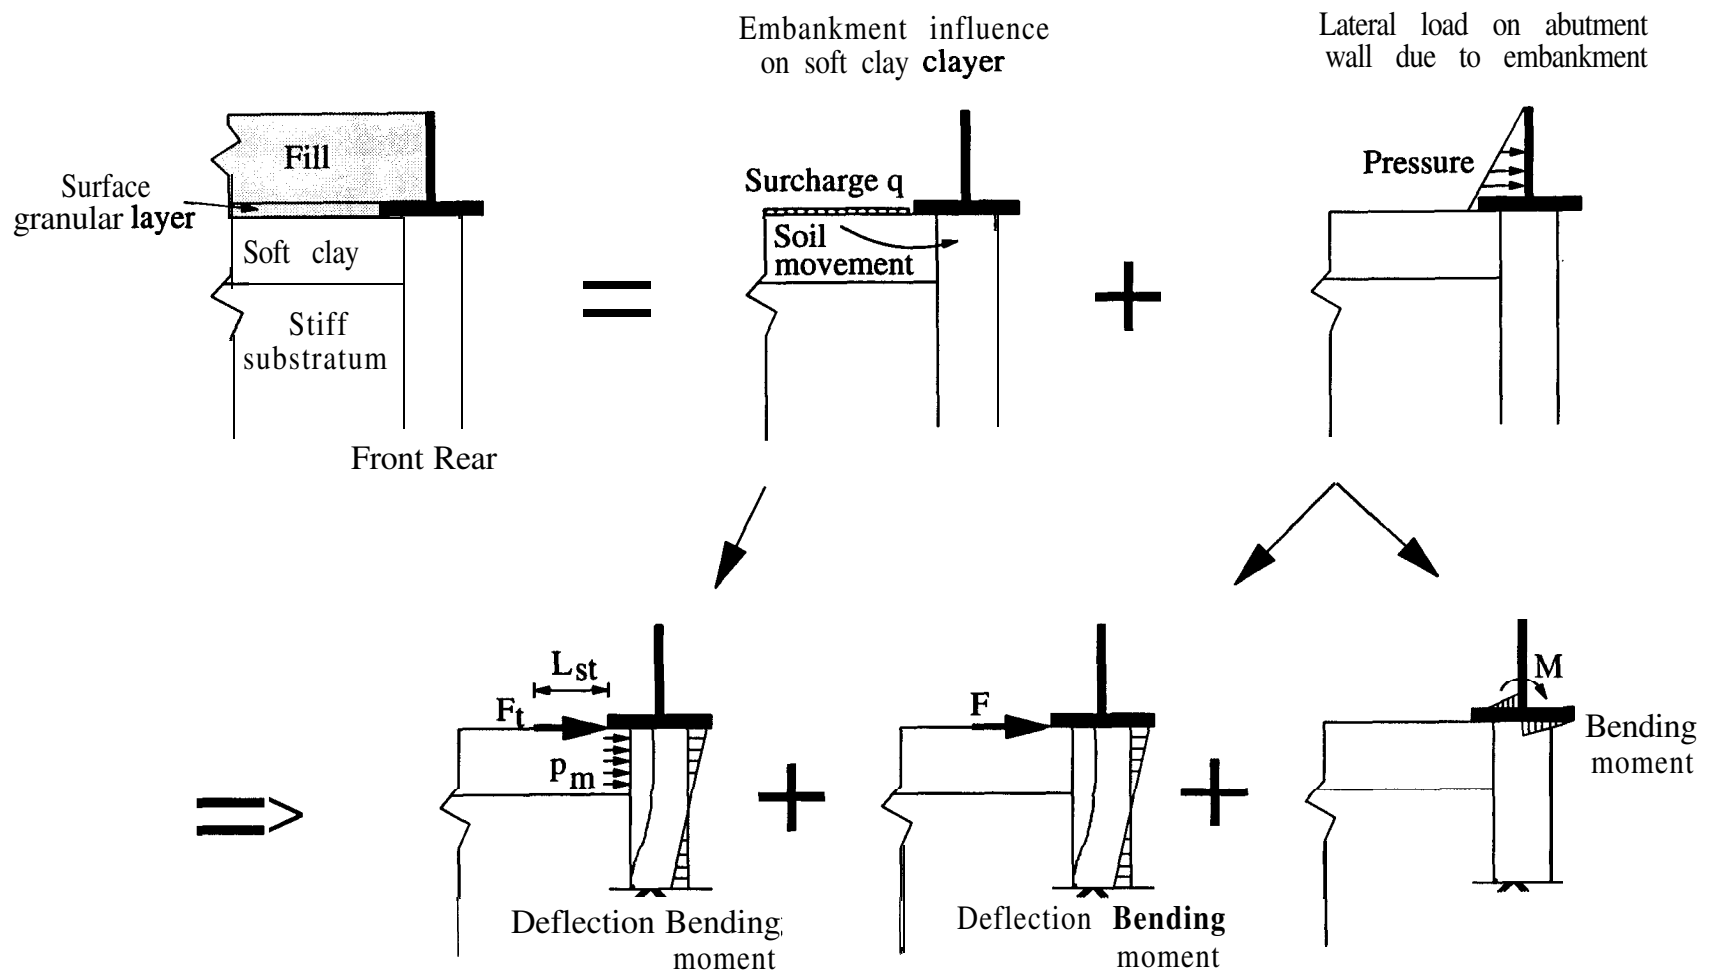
Idealised structural mechanisms for a full-height piled abutment
